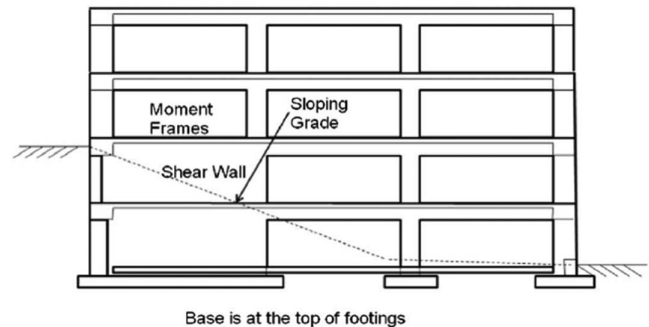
Building with vertical elements of the seismic force-resisting system supporting lateral earth pressures.
